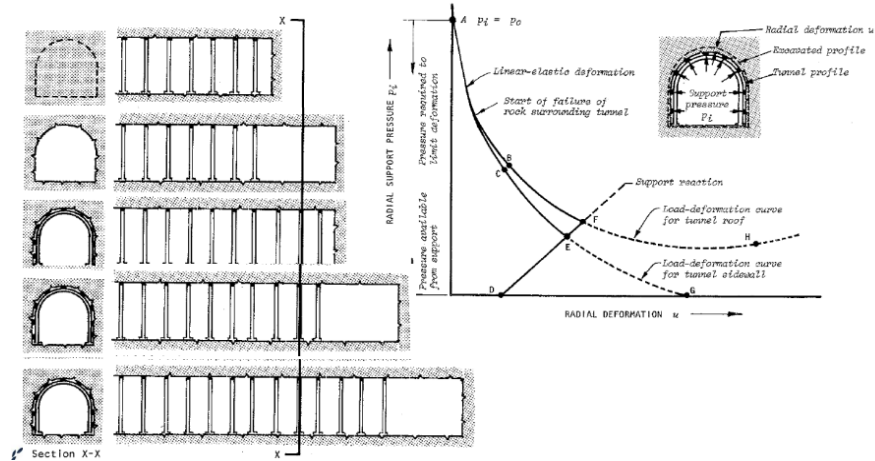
Advance of the tunnel face and installation of supports (left) and Tunnel characteristic curve (after Panet, 1995)
